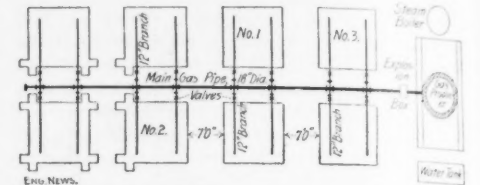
Plan Showing Arrangement of Plant for Making Fire Tests of Fireproofing, Regent's Park, London, England.
